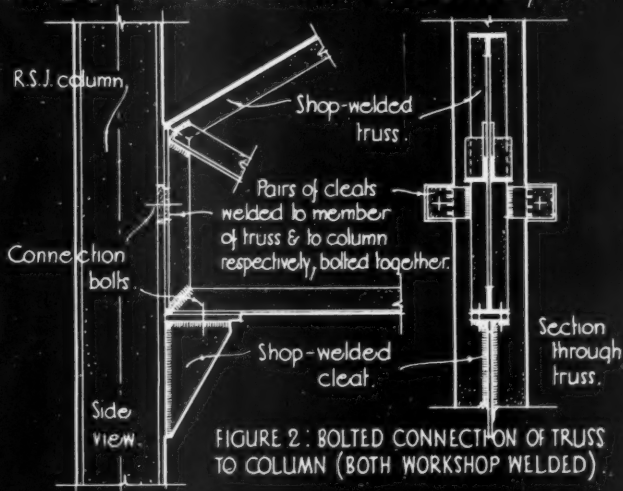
BOLTED CONNECTION OF TRUSS TO COLUMN (BOTH WORKSHOP WELDED)
